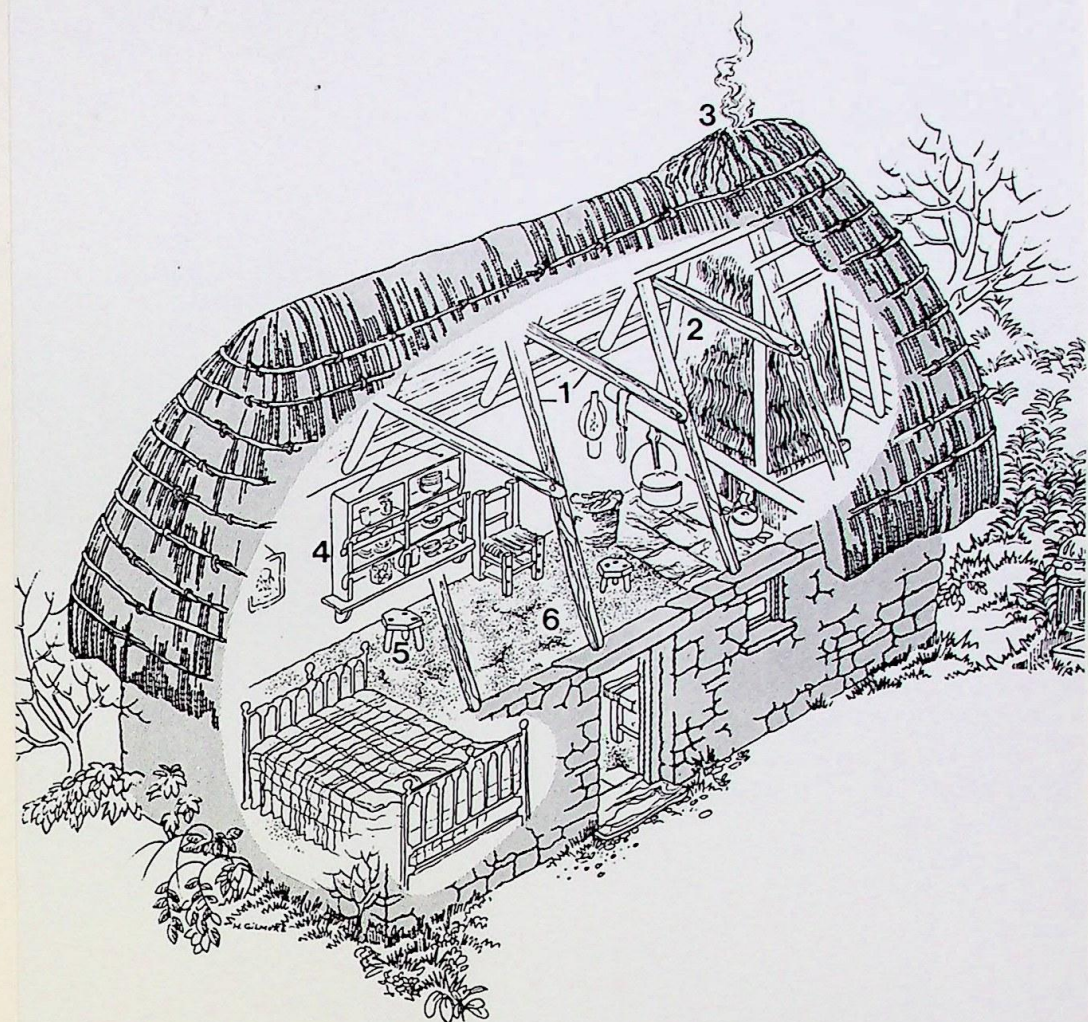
, Collar beam roof trusses, this originally from Athea, Co. Limerick.
